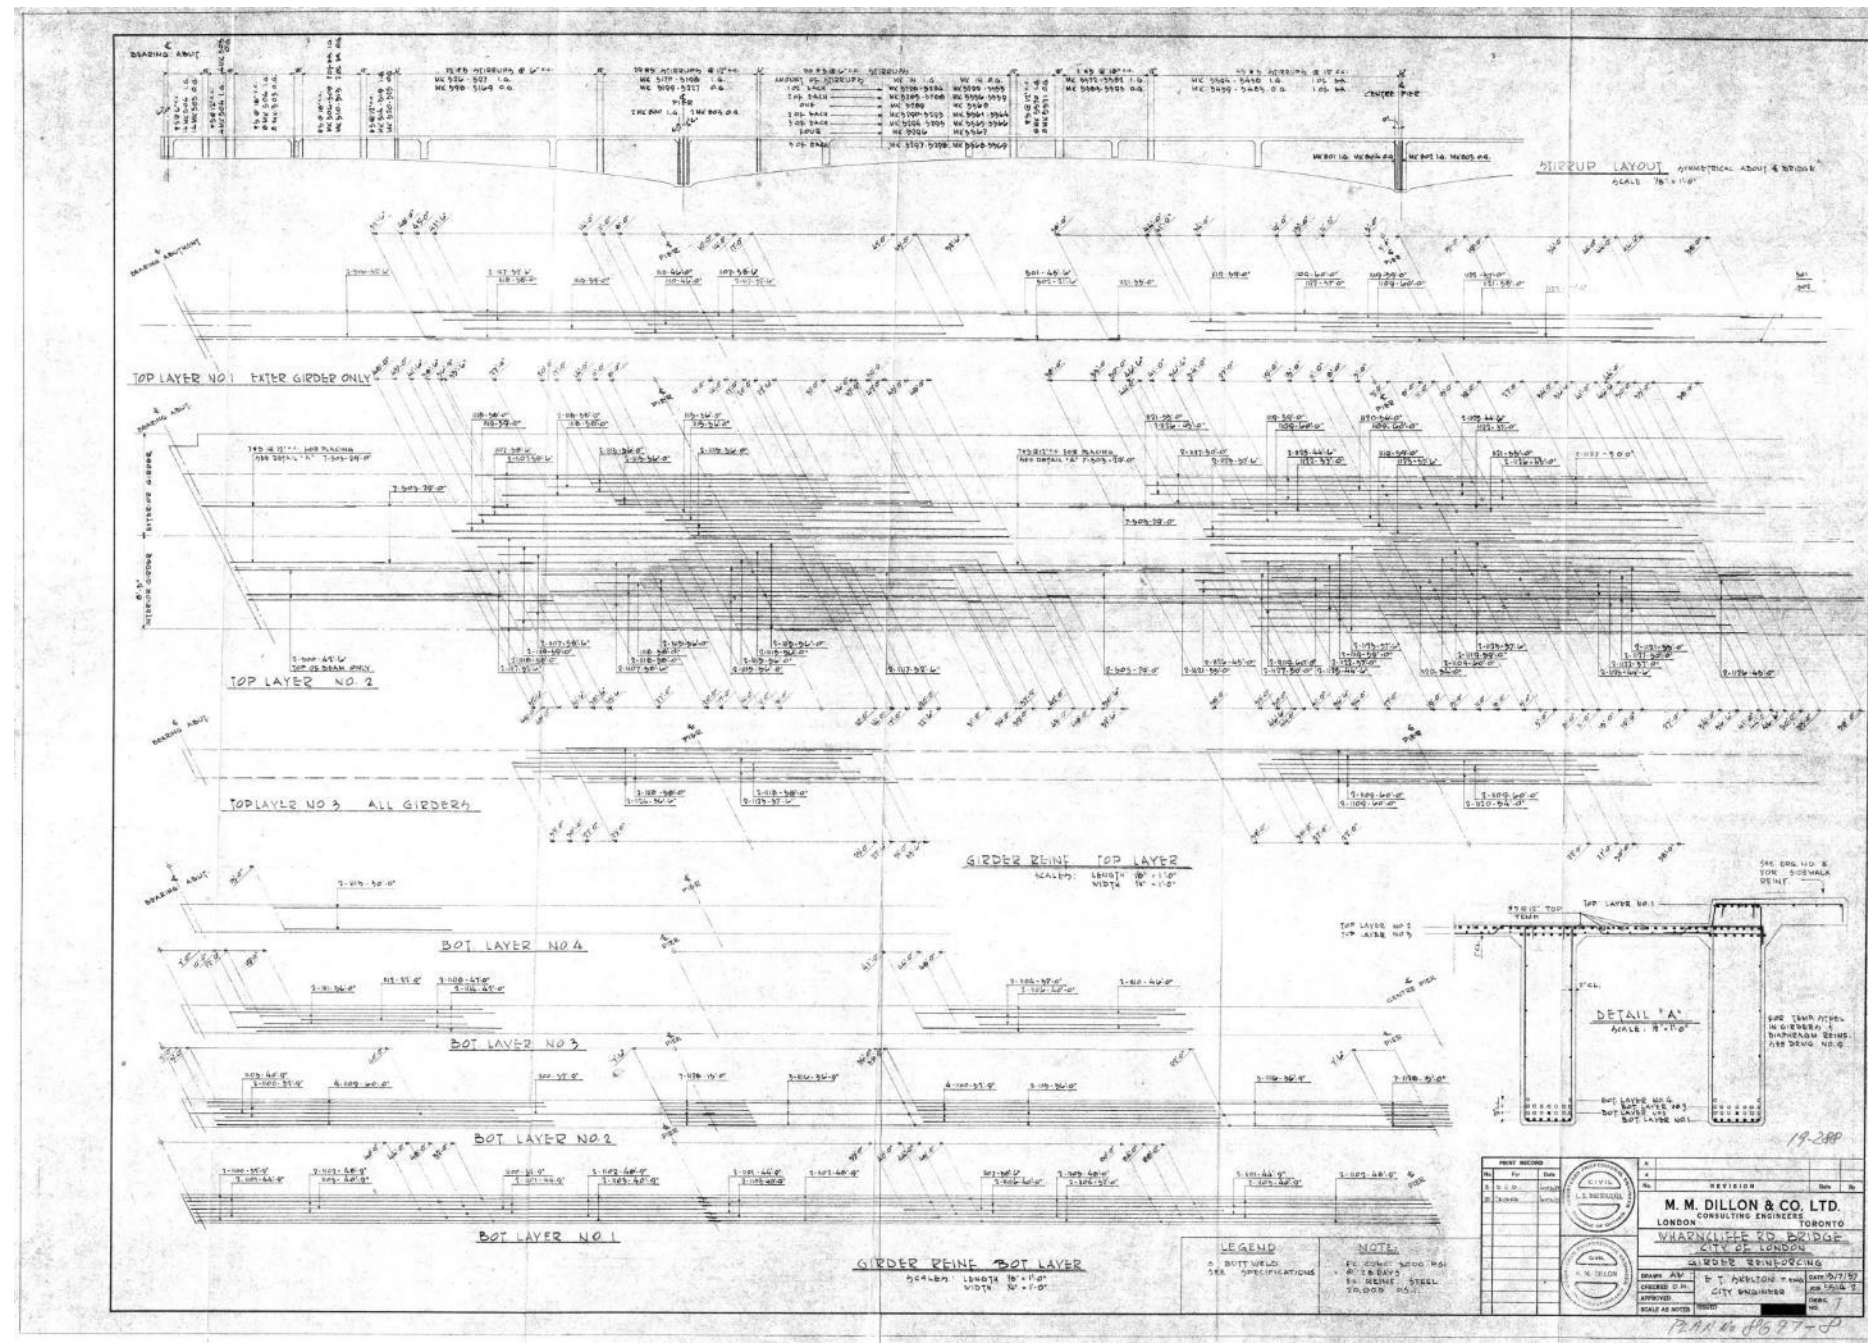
Girder Details of Wharncliffe Road Bridge, 1957
